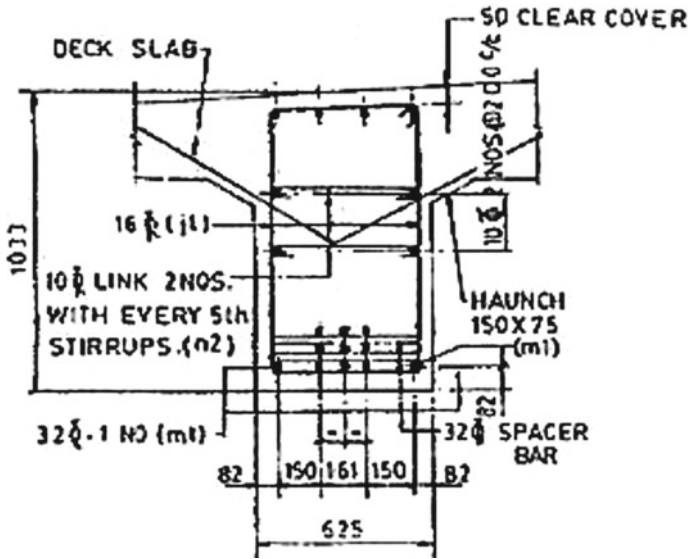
Cross section of T-beam bridge girder for 10 m Span(MORTH)
